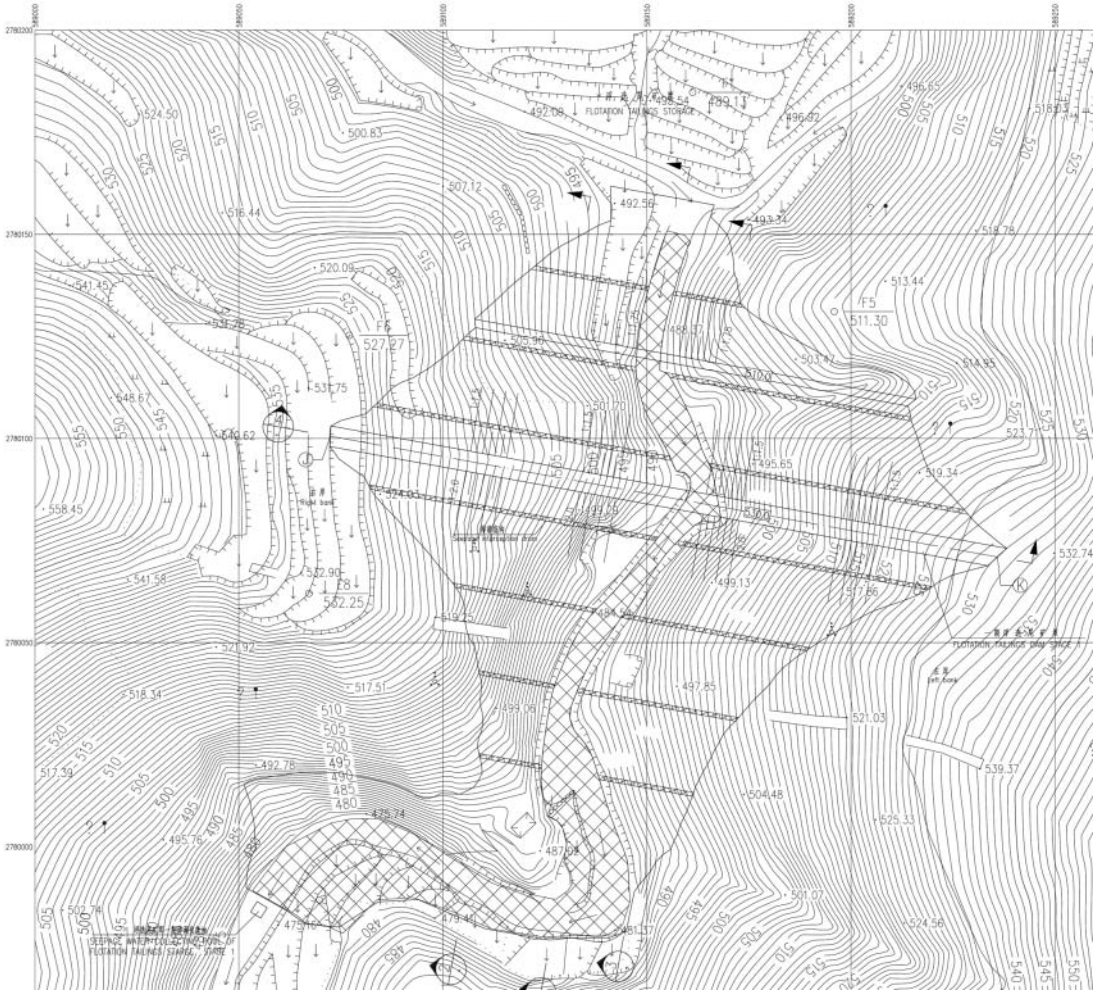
Flotation Tailings Storage Embankment (NERIN, June 2005)
